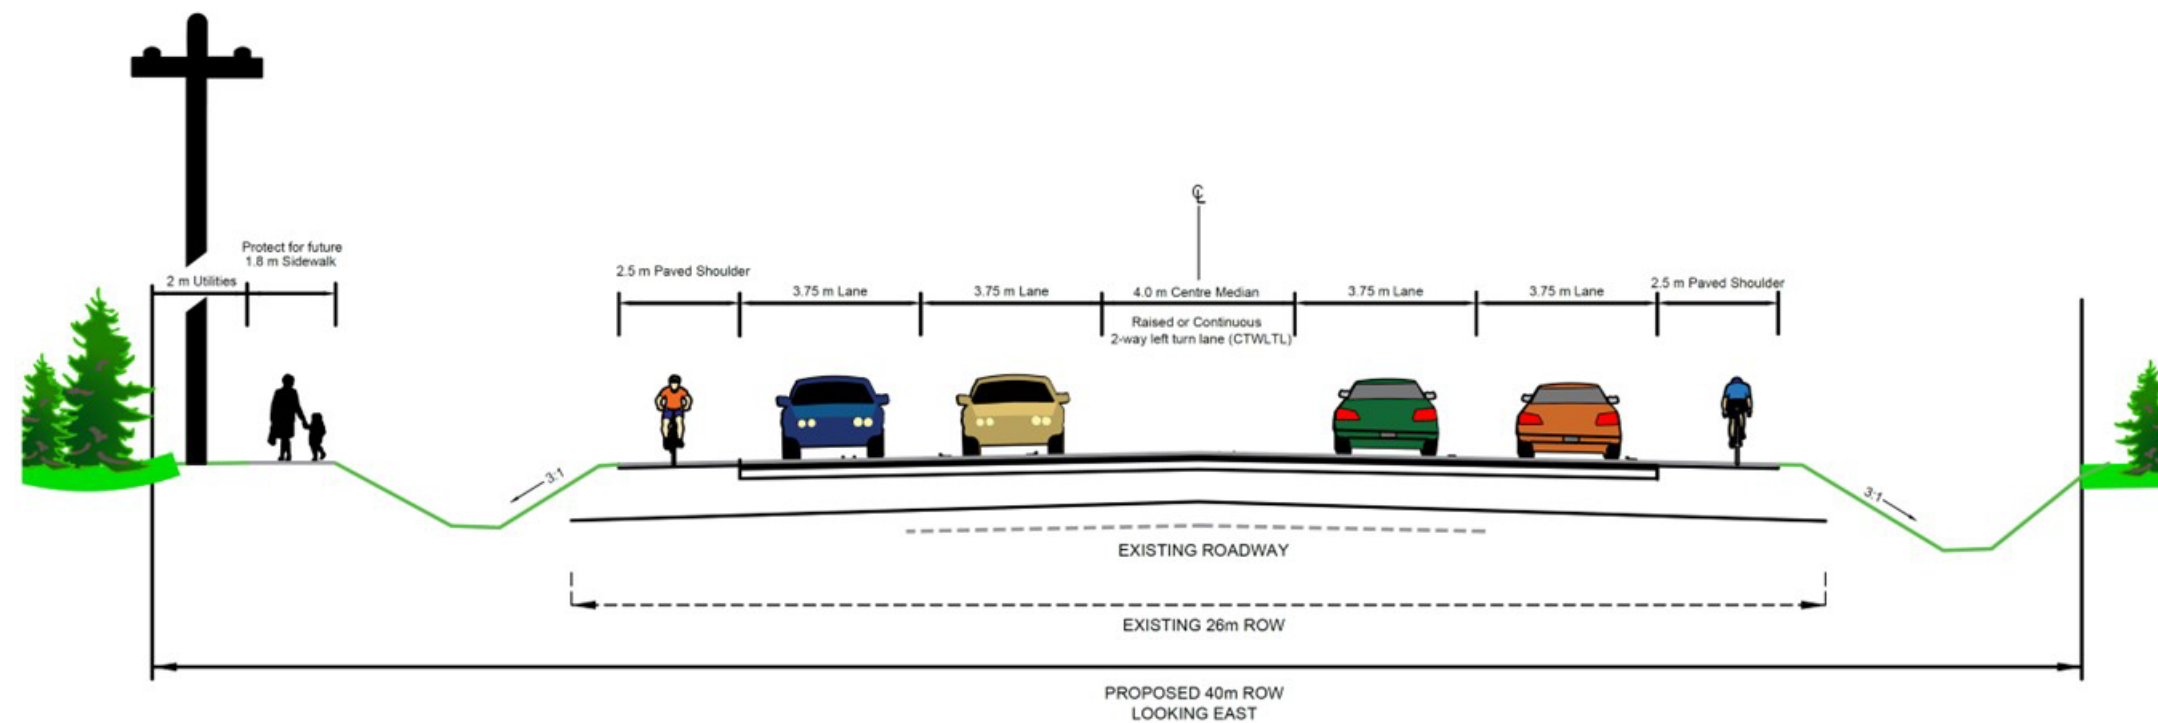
Section 1 and 2 (Highway 401 to Concession Road 9) Recommended Cross Section
